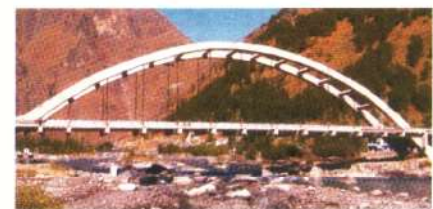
Bridge over Parvati at Jia on Nh21 arch bridge with suspended deck
